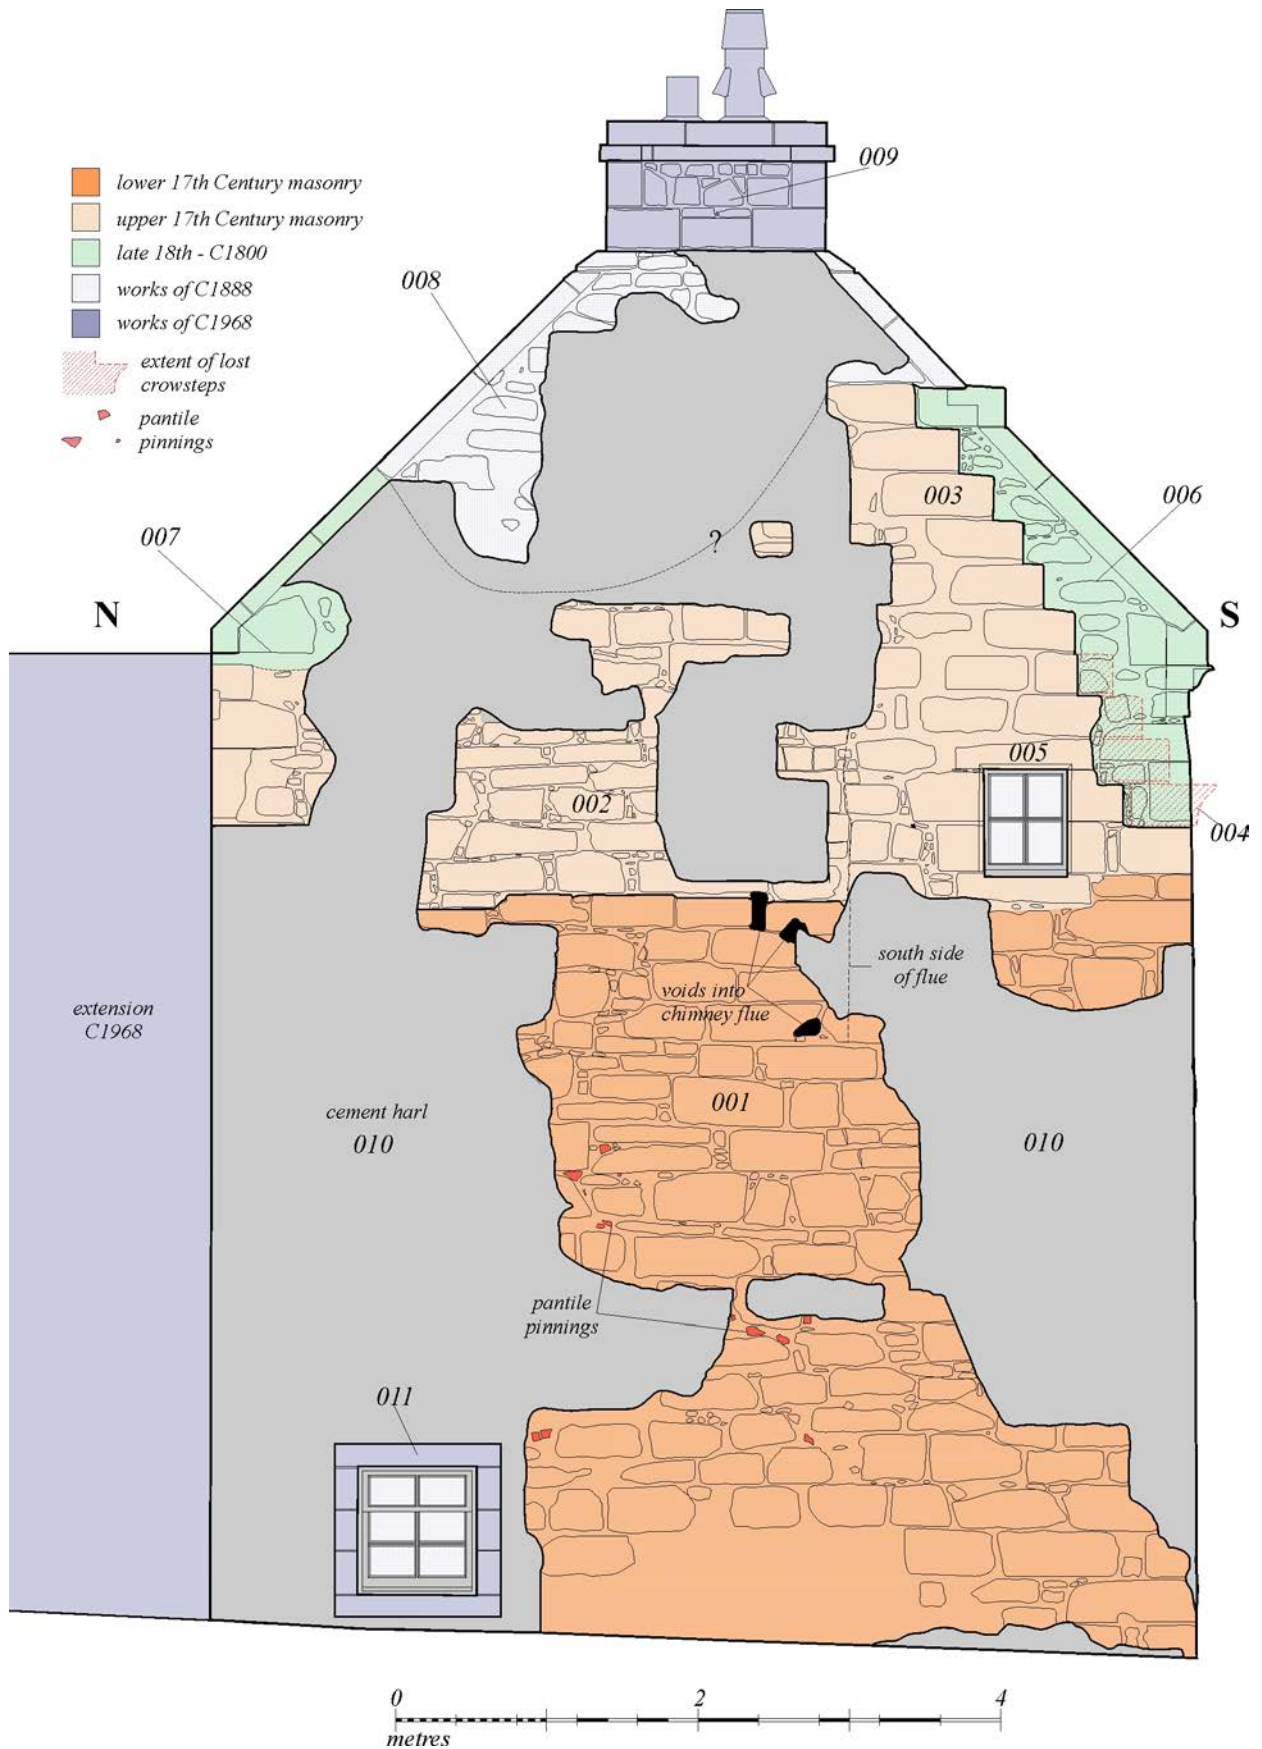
Phased elevation drawing of the west gable wall of Sandhaven West
